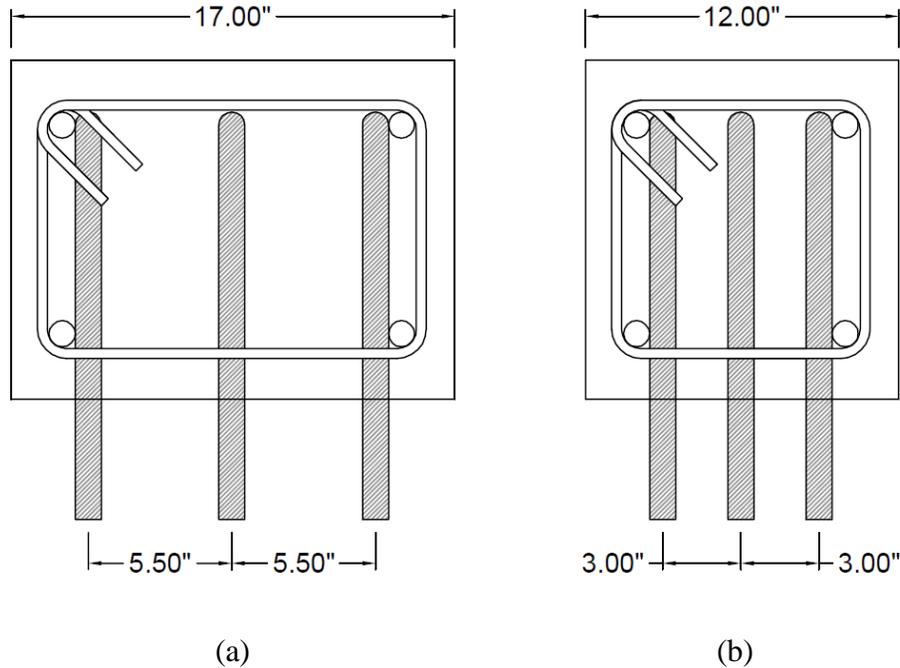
Typical configuration of multiple hook specimens with (a) $5.5d_b$ and (b) $3d_b$ center-to-center spacing between No. 8 bar hooks
